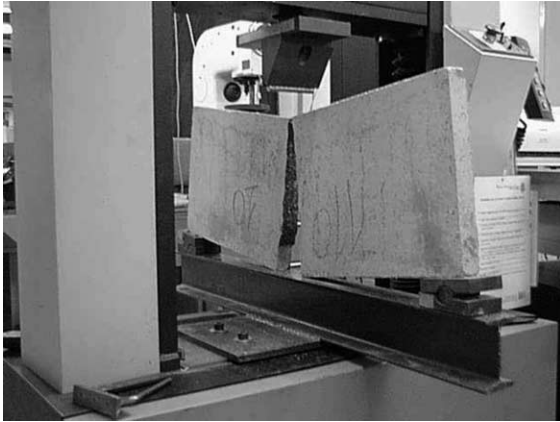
Test set-up using a closed-loop servo-controlled Instron testing machine model 5500 R. Specimen with $d=304.8$ mm.
